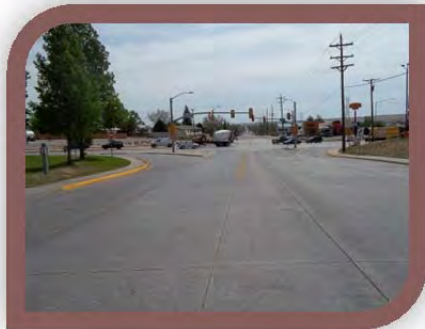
, Existing South/ North Greeley Intersection at Fox Farm Road
